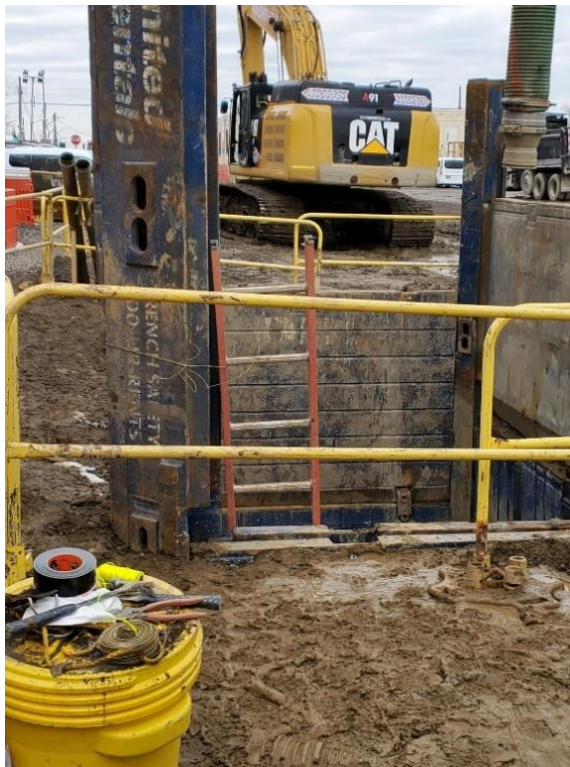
Excavation north of 2.5 acre BUD area adjacent to western perimeter for 42in sewer manhole installation
